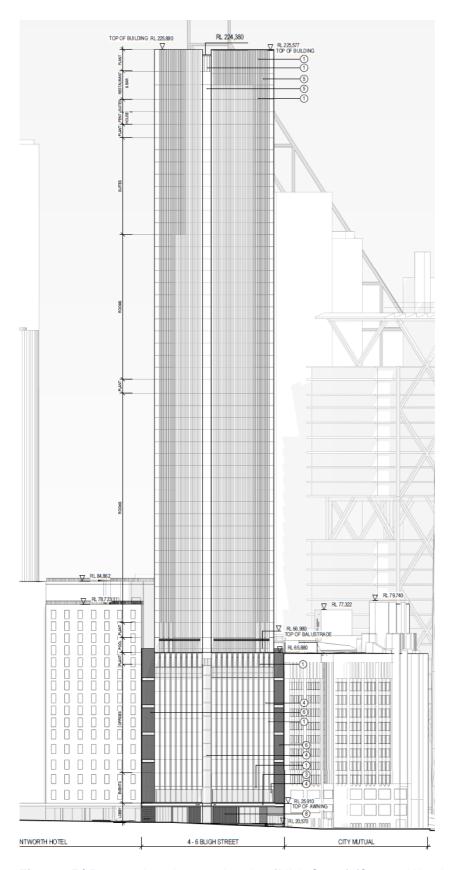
| Proposed north west elevation (Bligh Street) (Source: Woods Bagot)
